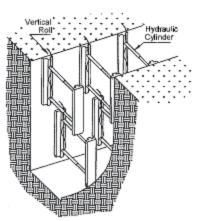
SHORING VARIATIONS: TYPICAL ALUMINUM HYDRAULIC SHORING INSTALLATIONS.
